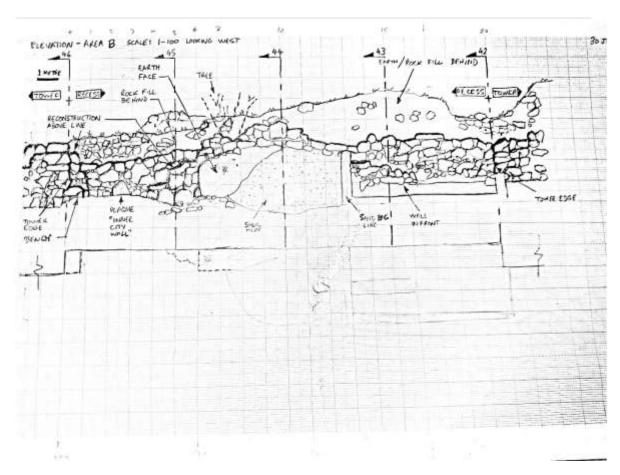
Facade of Stratum V city wall (W160). Stratum VI city wall (W1213) is located below W160.
